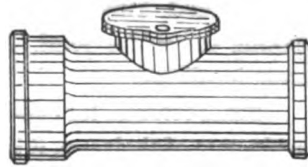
Bolted-Plate Clean-Out on Soil-Pipe.
